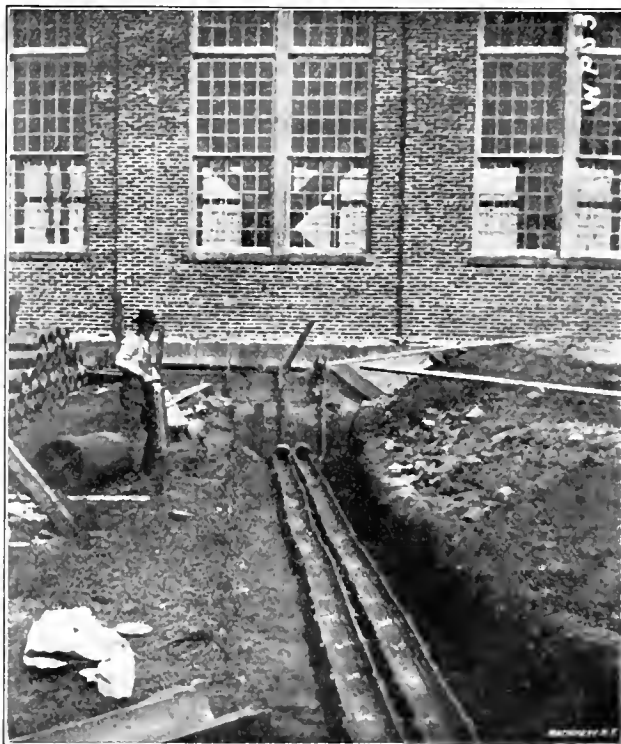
Laying Split Tilt Pipe for Running Pipes Underground.
